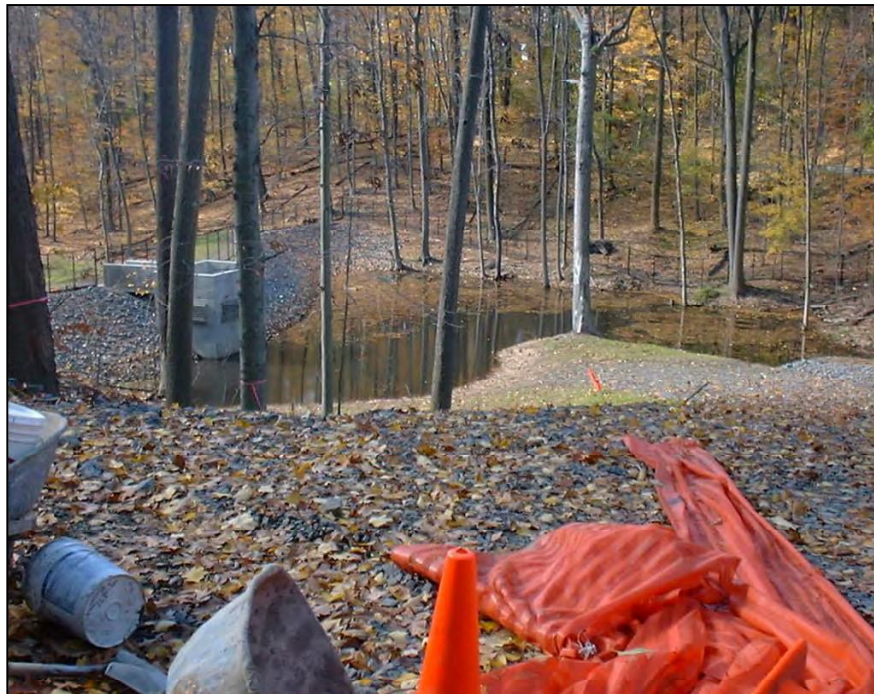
Construction access and staging is always a challenge for crossing retrofits
